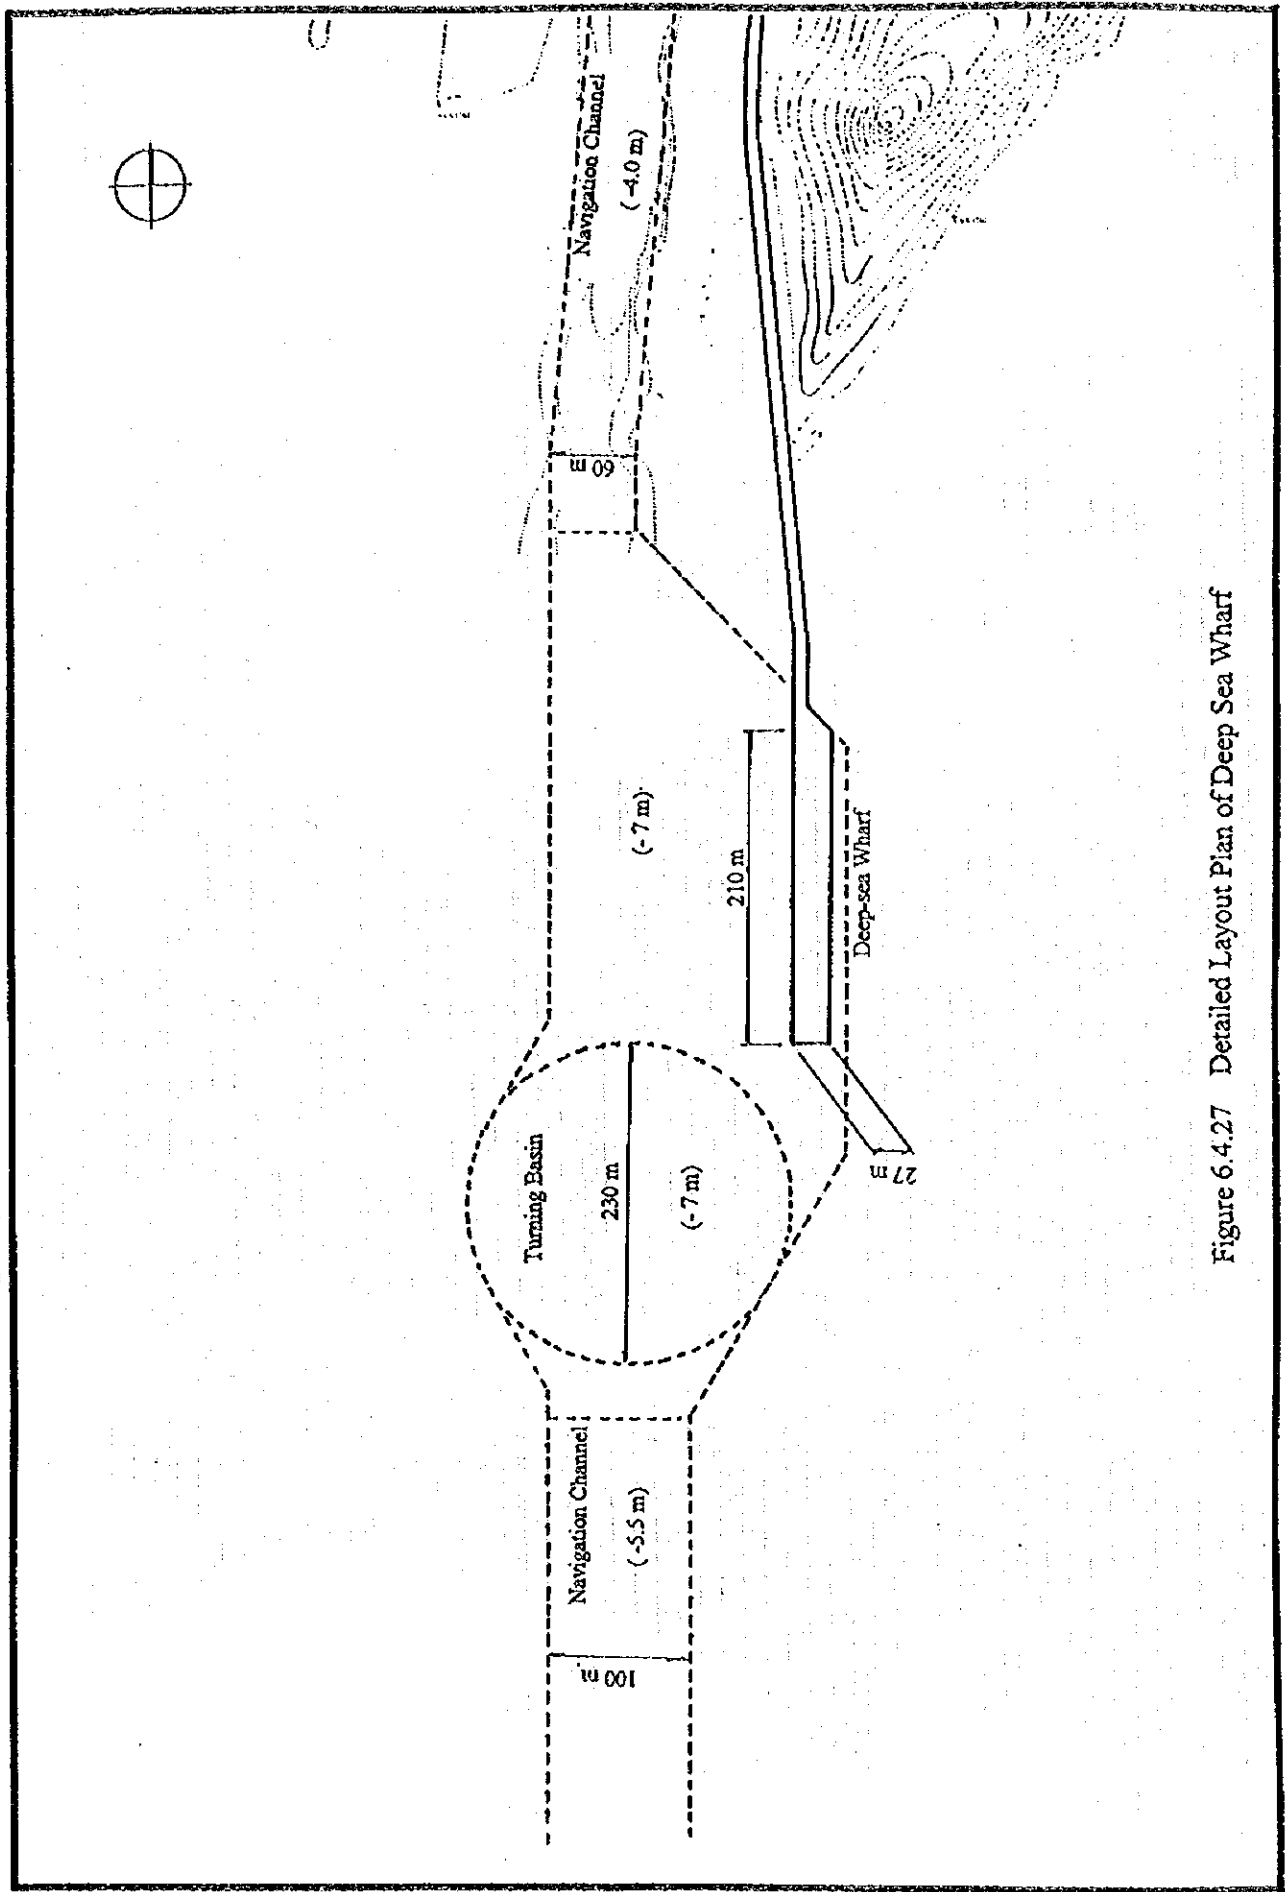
Detailed Layout Plan of Deep Sea Wharf
